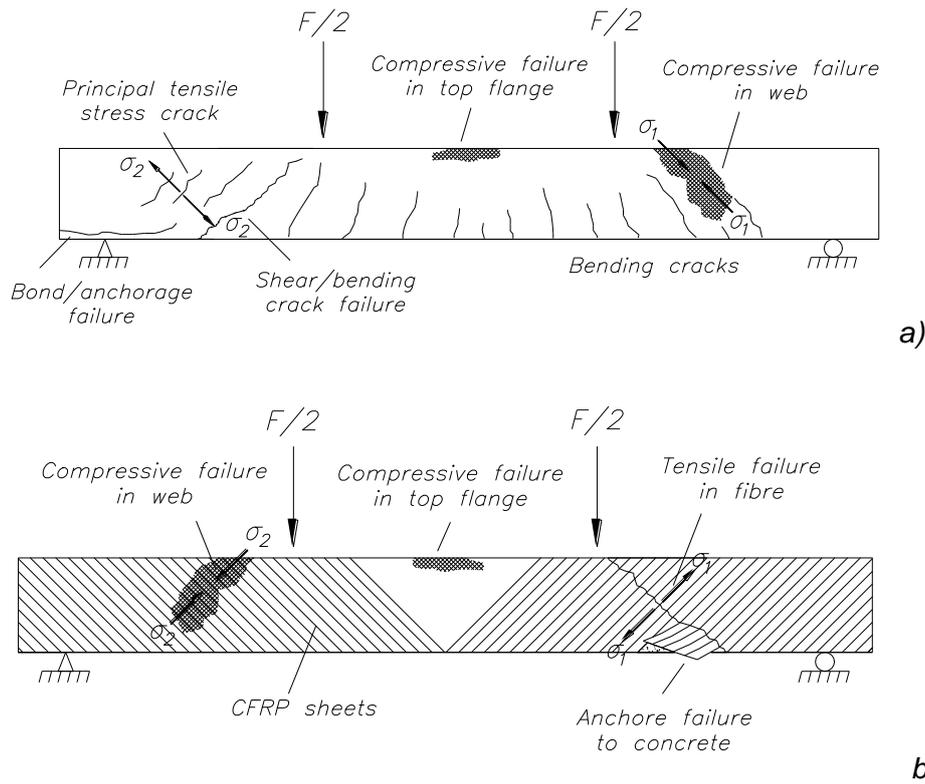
a) Shear failure in an unstrengthen concrete beam, b) Possible failure modes in an FRP strengthen beam
